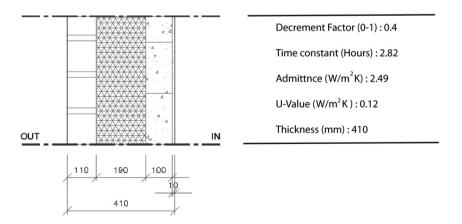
From Out to in: 110mm Brick Outer Leaf, 190mm Phenolic Insulation, 100mm Aerated Concrete Block, 10mm Lightweight Plaster
